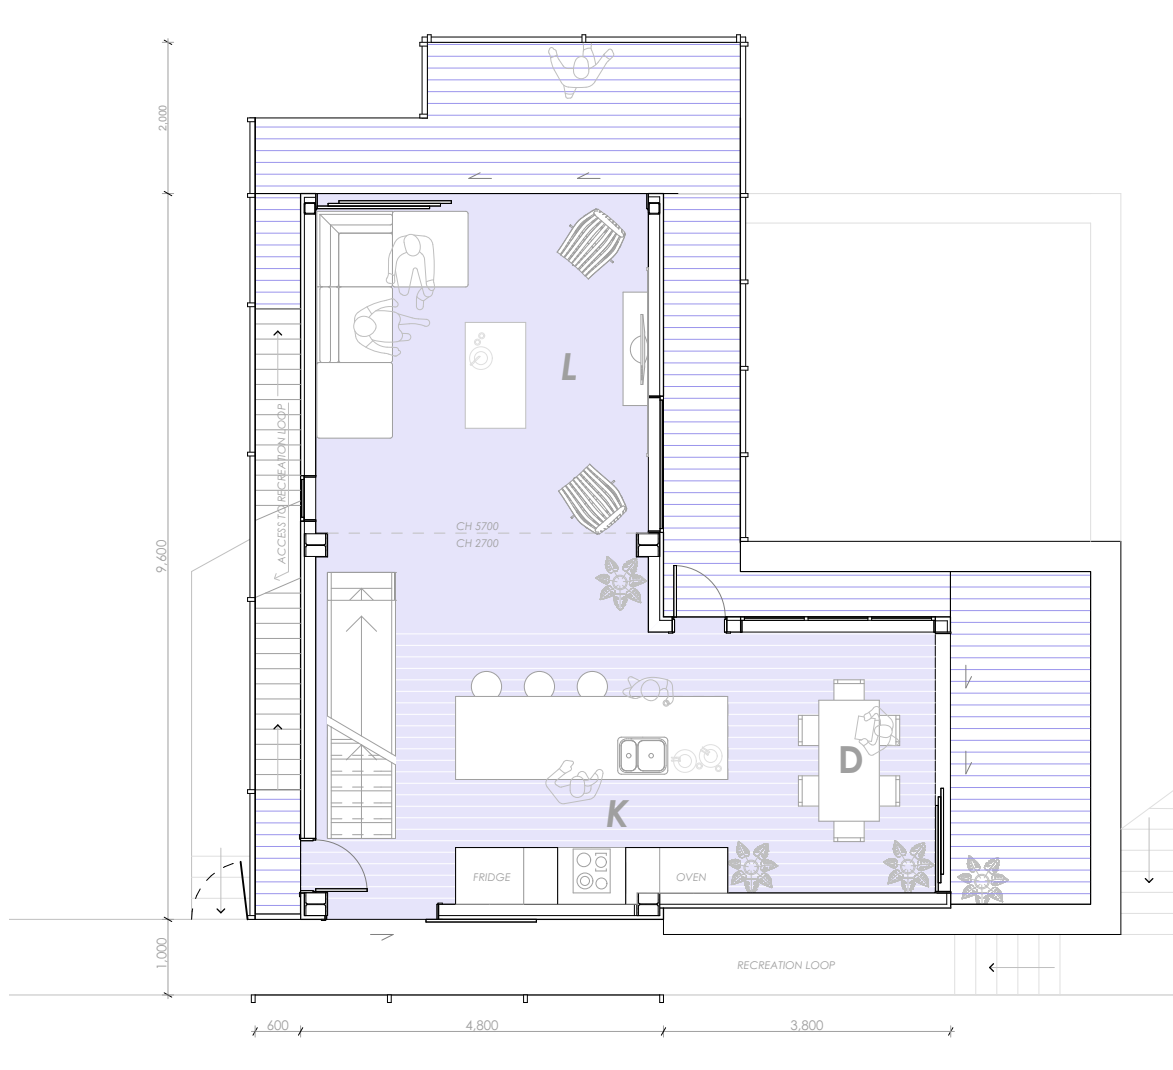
| Living area floor plan (5th floor) 1:100.
